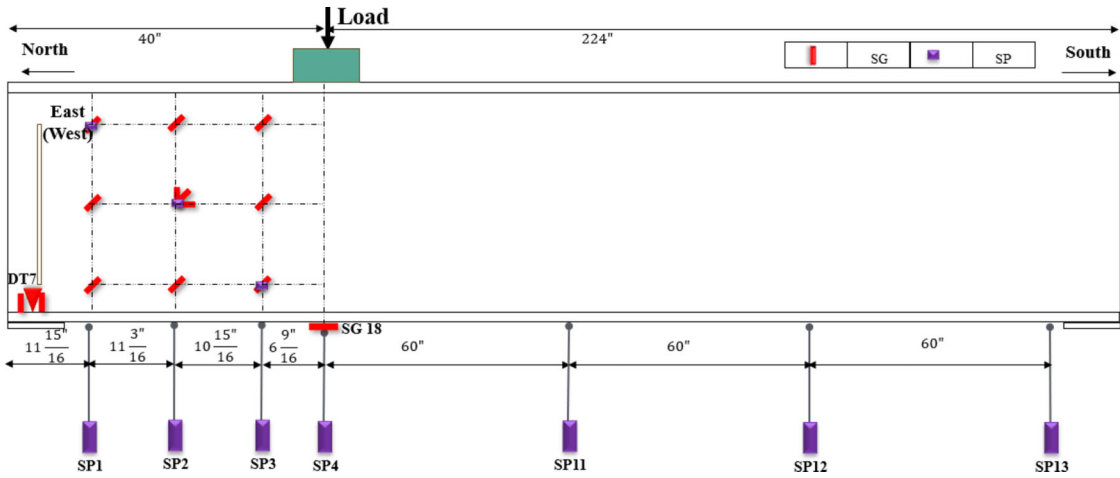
Displacement sensor layout (side elevation): Specimens 1–6.
